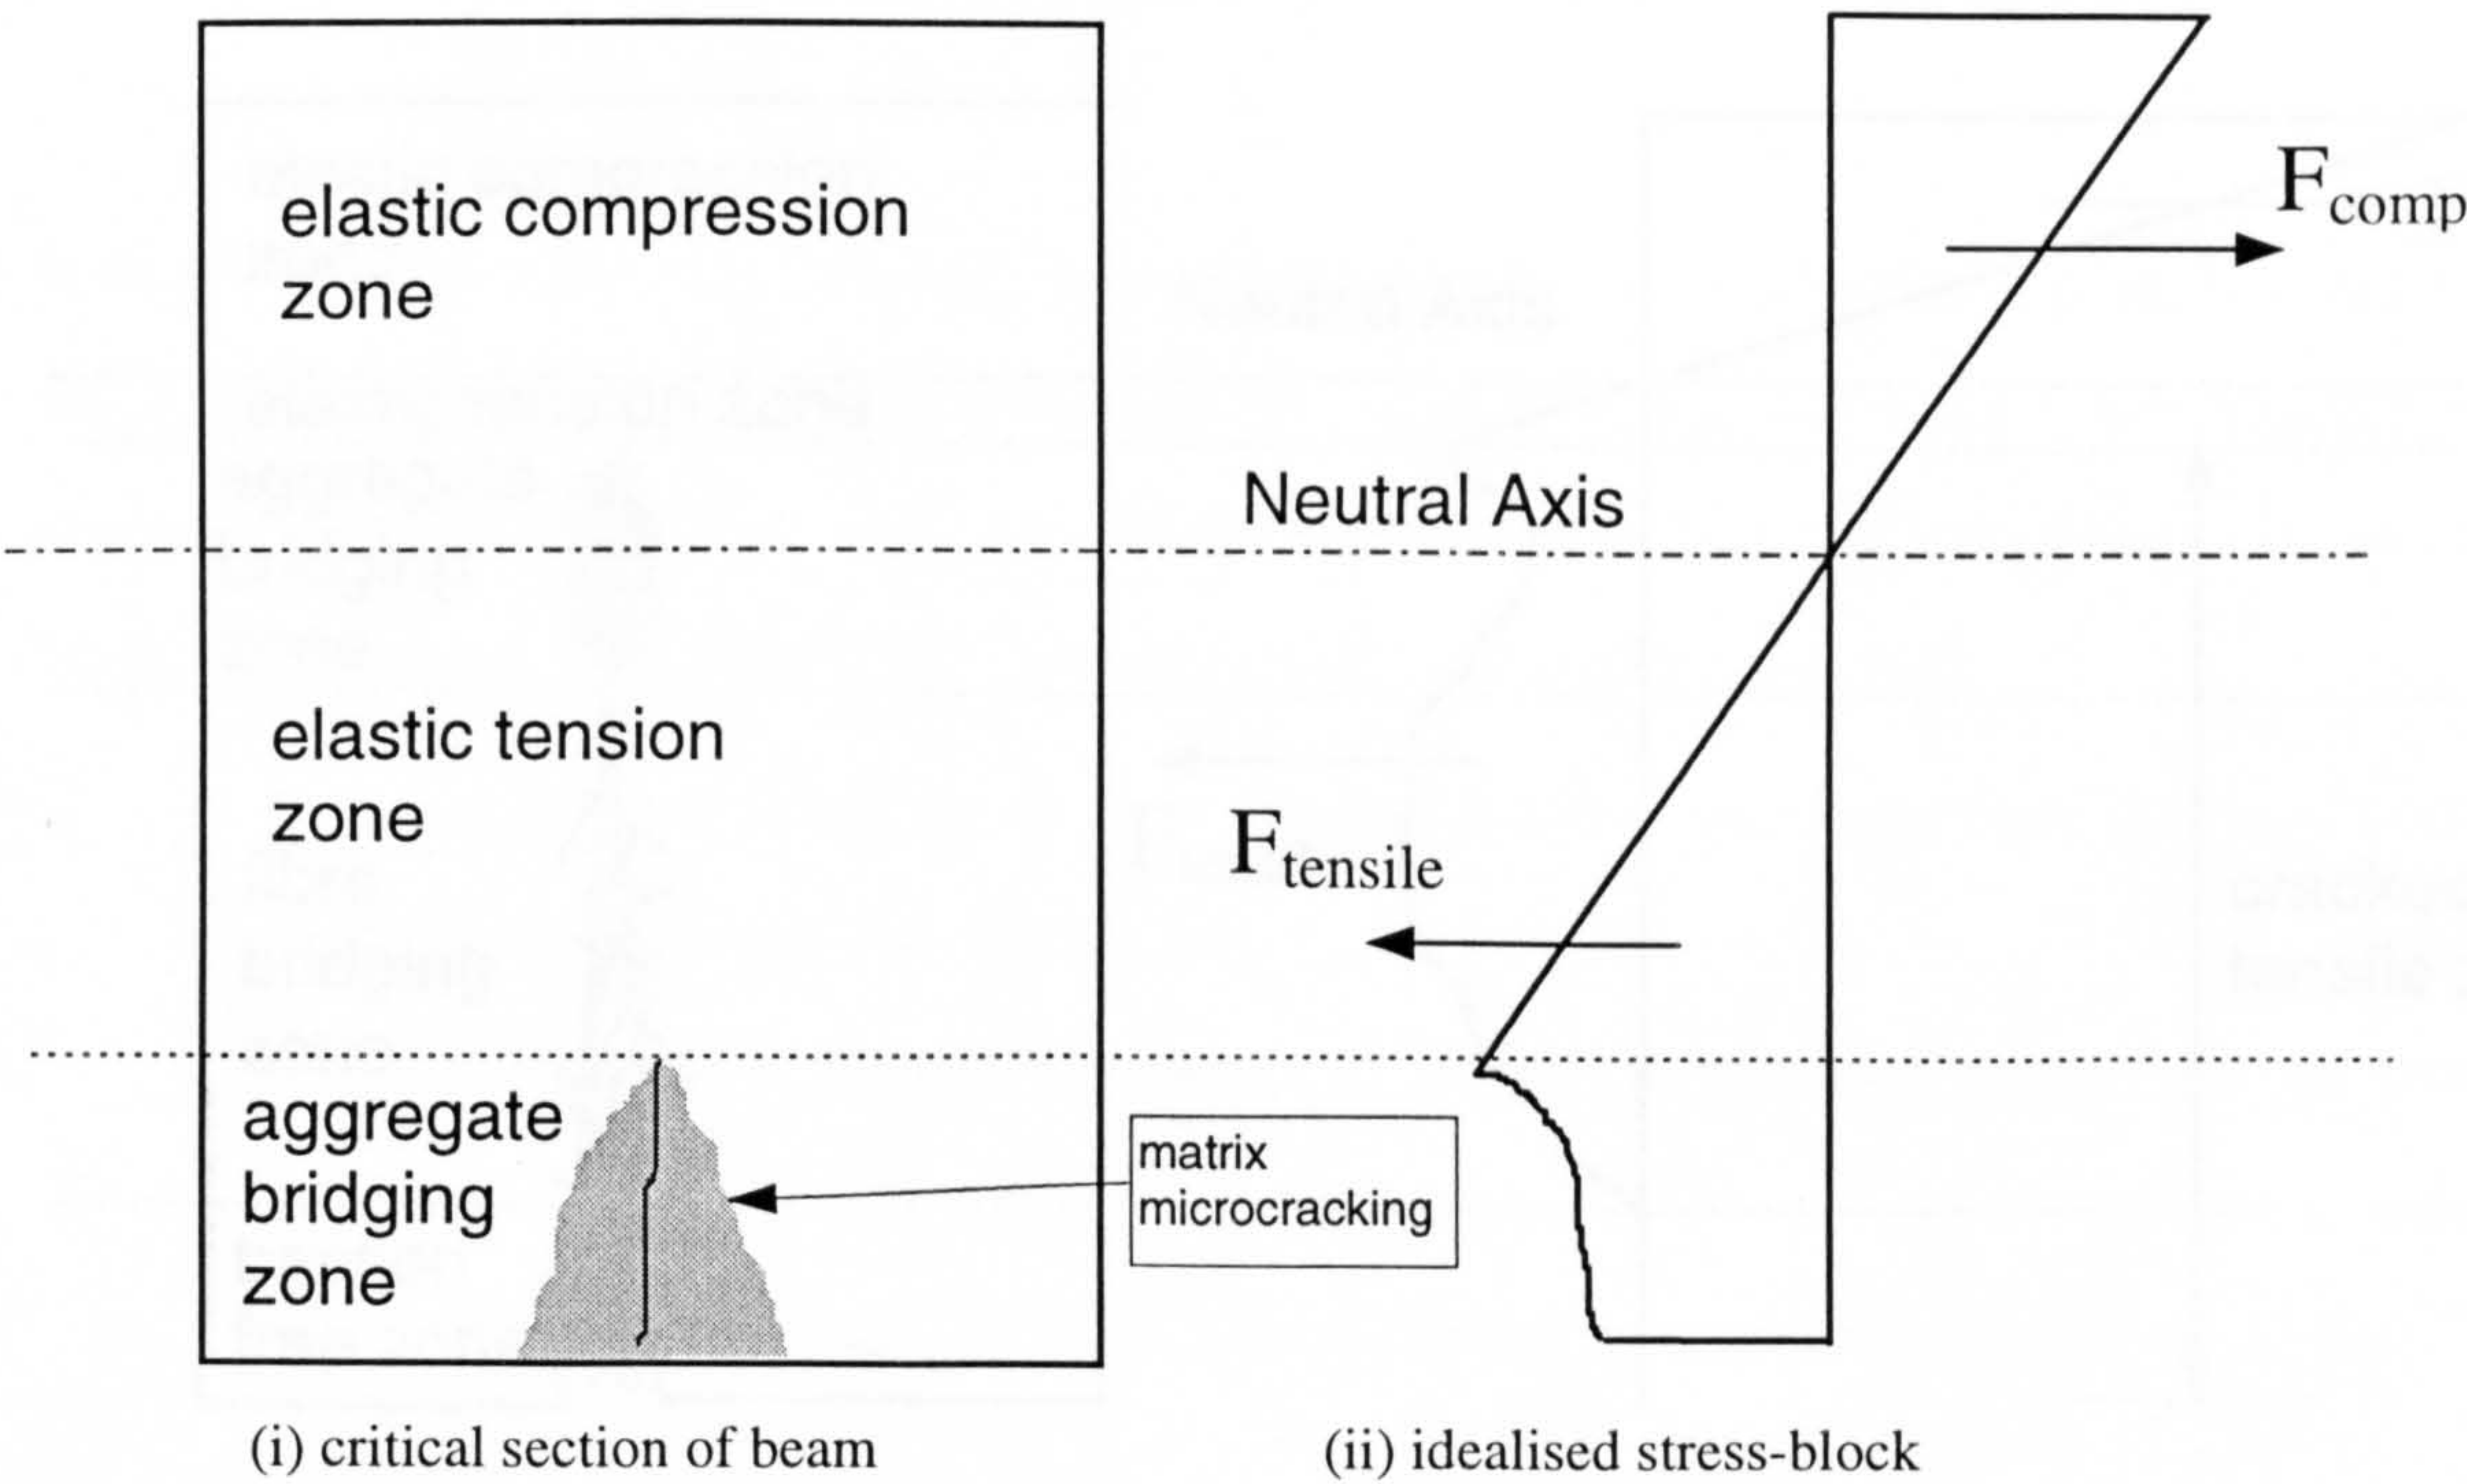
(b) Schematic representation of a steel fibre reinforced concrete beam under flexural loading: Stage 2 - initial cracked response.
